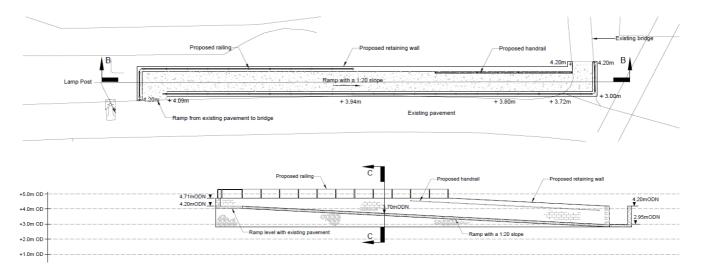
Plan and Indicative Cross Section of the Closed Off Embankment with 'U' Ramp
